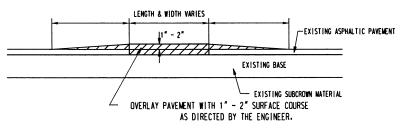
DETAILS OF REPAIRING EXISTING PAVEMENT PRIOR
